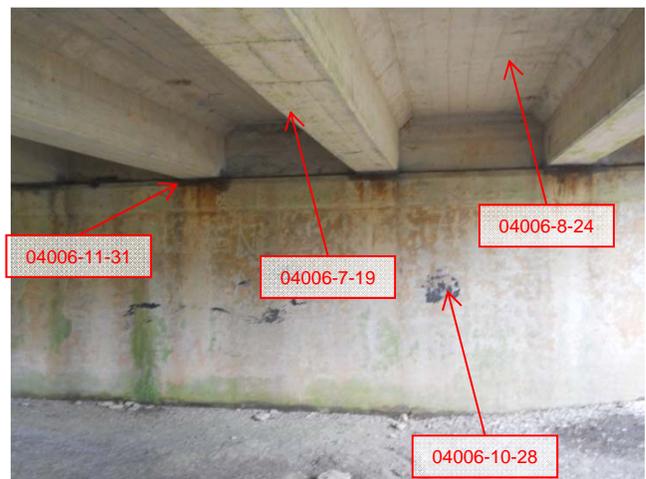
View of bridge looking east from bank of Little Richland Creek.
